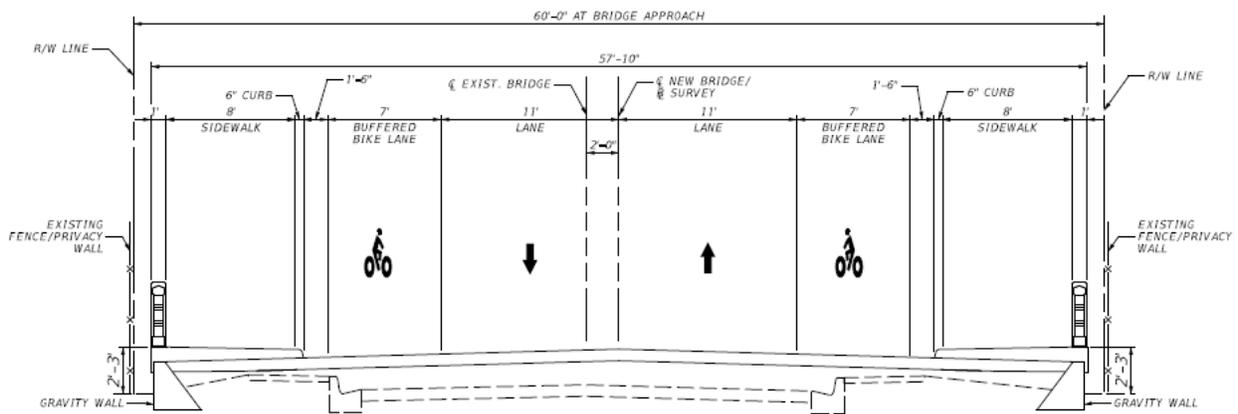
Replacement Alternative 7: Raised Bridge Profile
